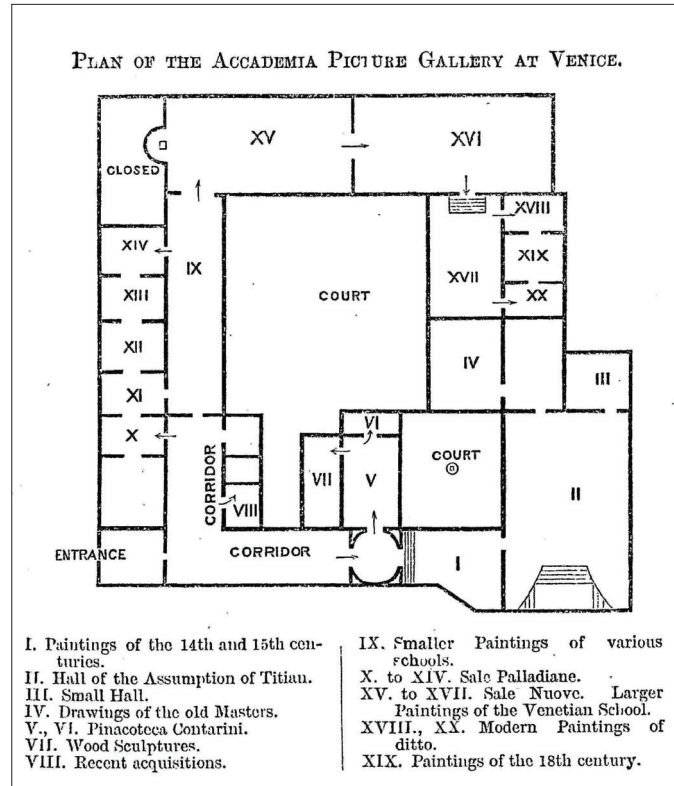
Plan of the Gallerie dell'Accademia. 1877
